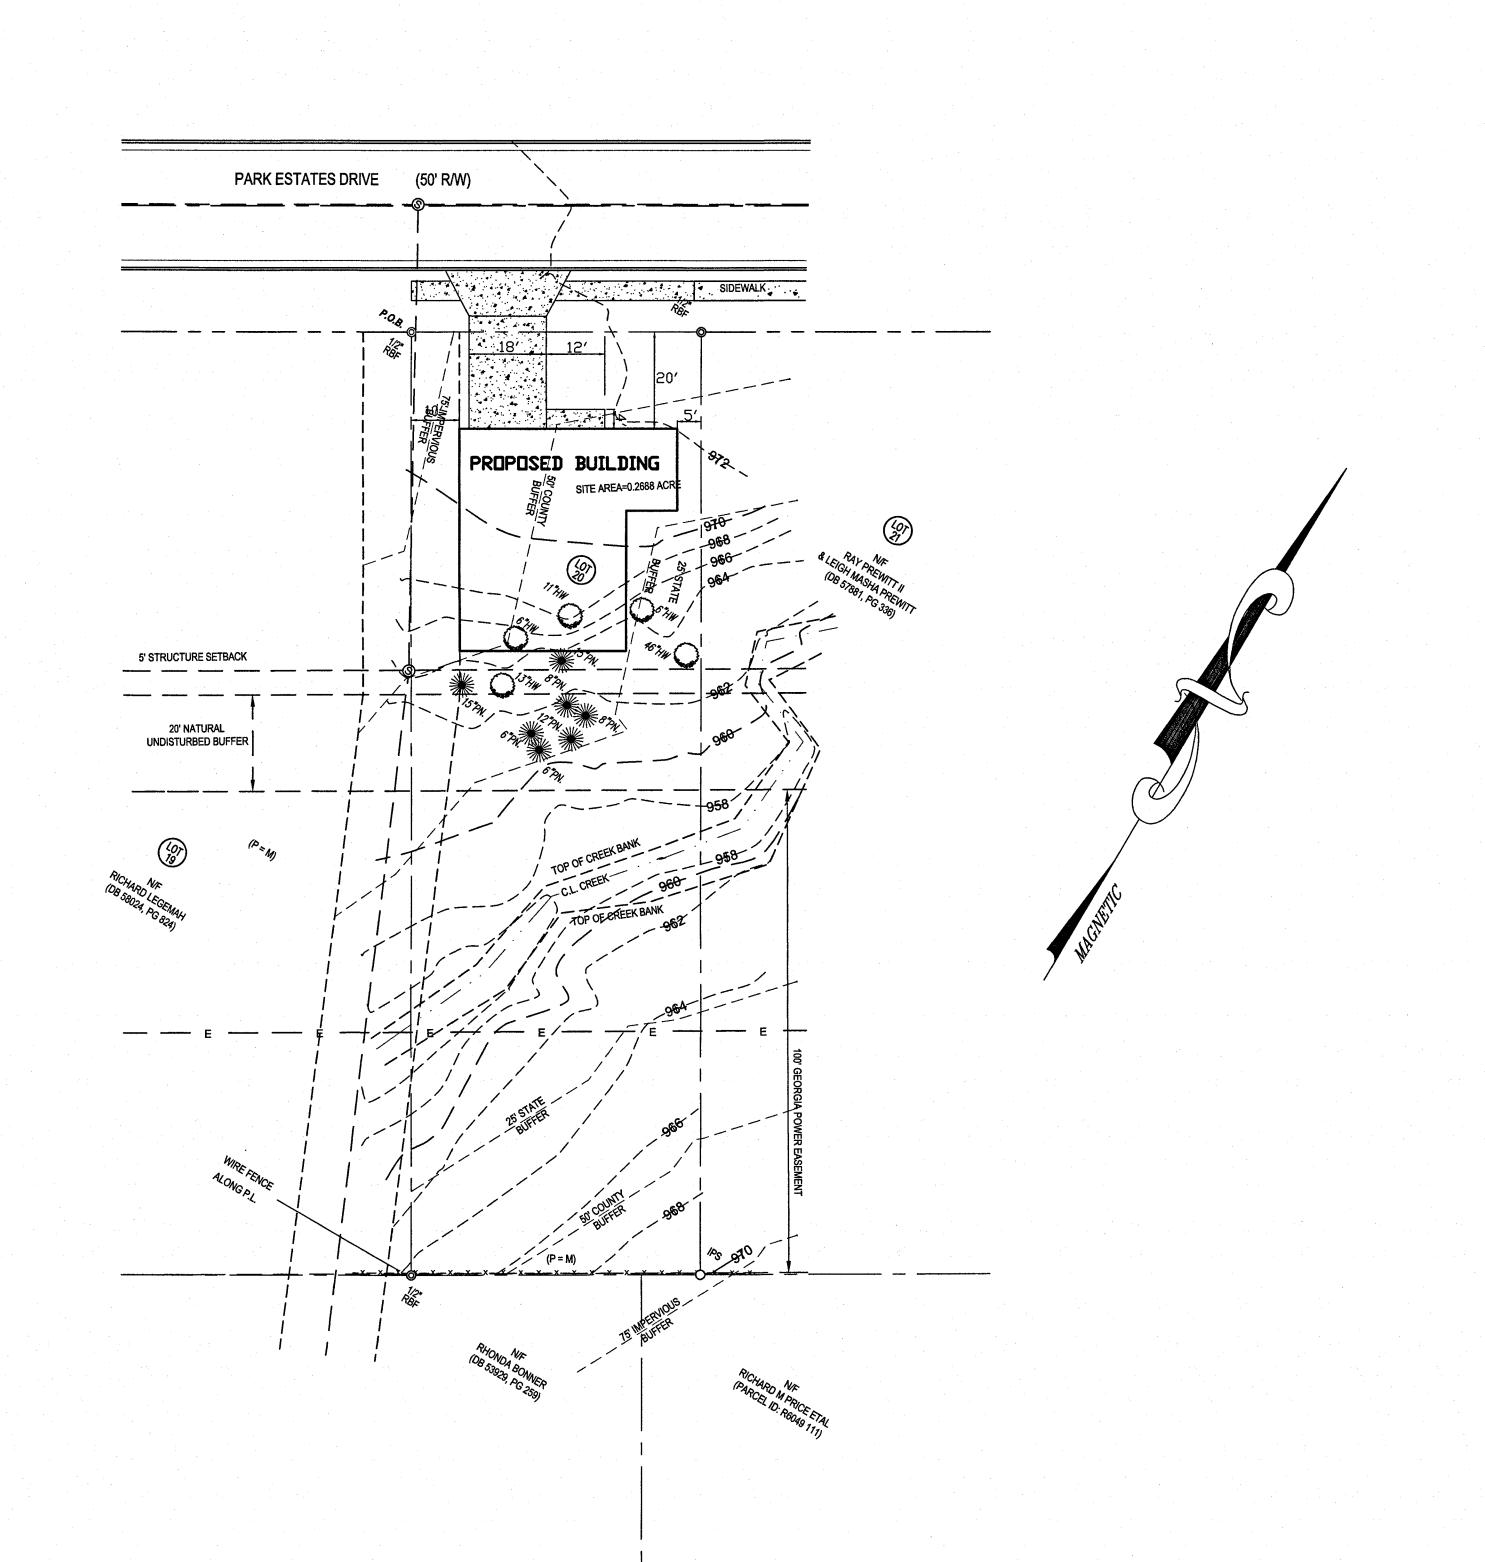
# Exhibit D: Existing Site Plan and Boundary Survey [attached]
